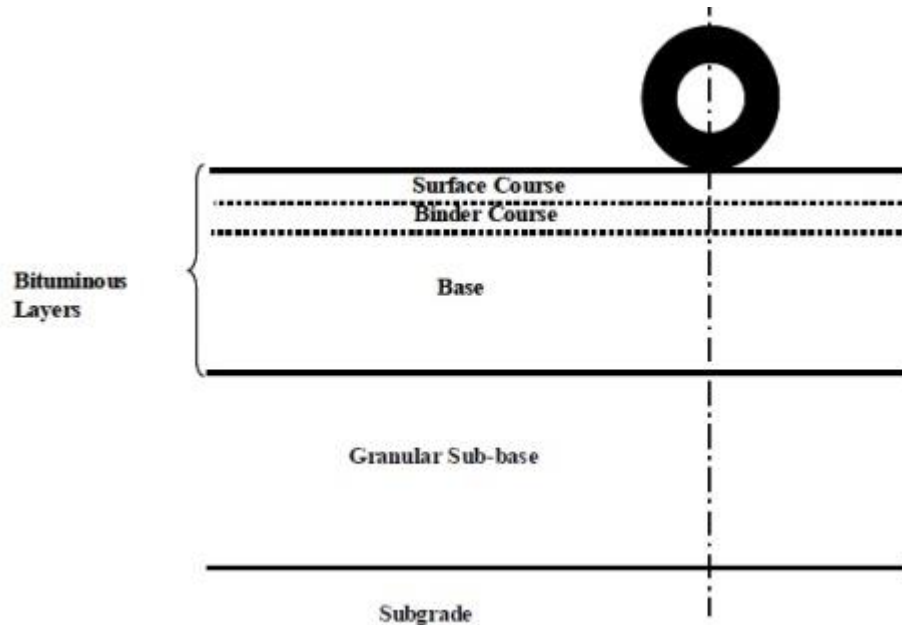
A Pavement of typical Flexible structure (Taherkhani, 2006)
